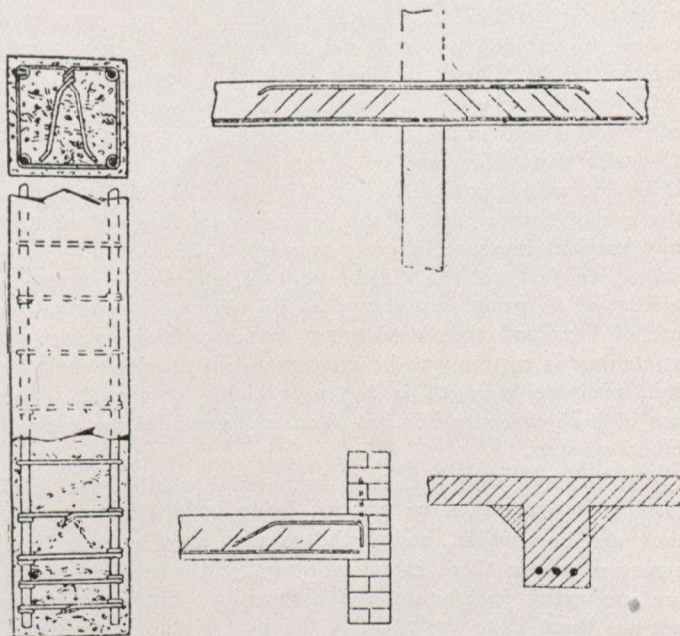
Arrangement of Column Reinforcement with vertical Rods and Loop-pieces.
